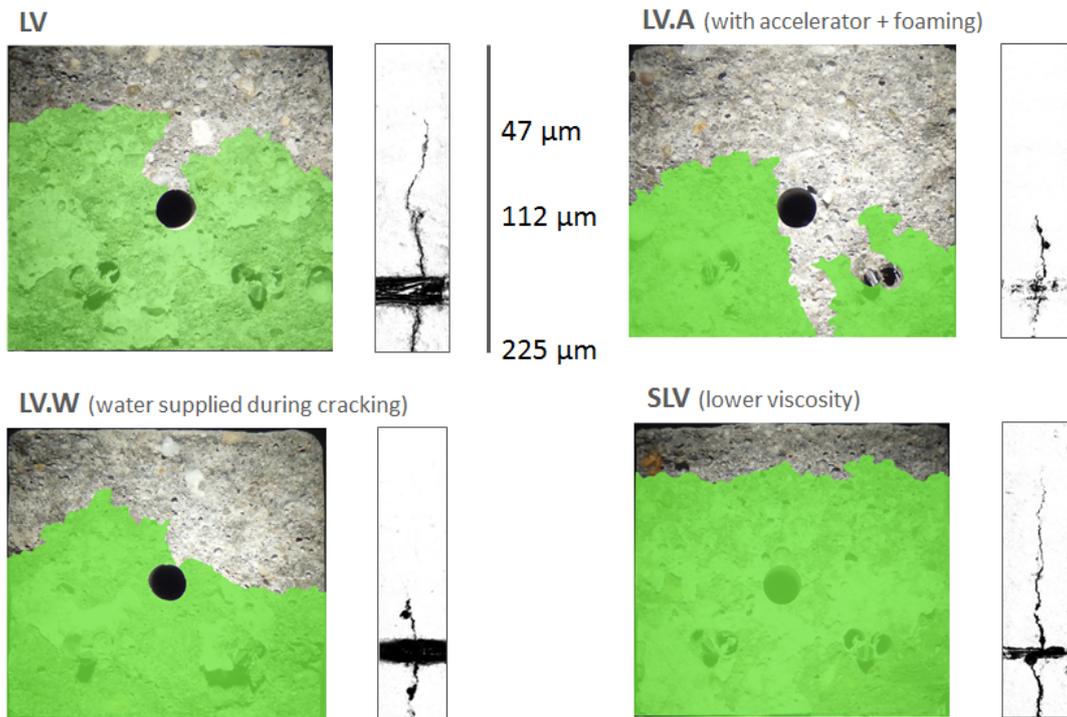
Assessment of healed crack area. Crack cross-section profiles are also shown highlighting the sections filled with polymer. Average crack width is displayed at different heights.
